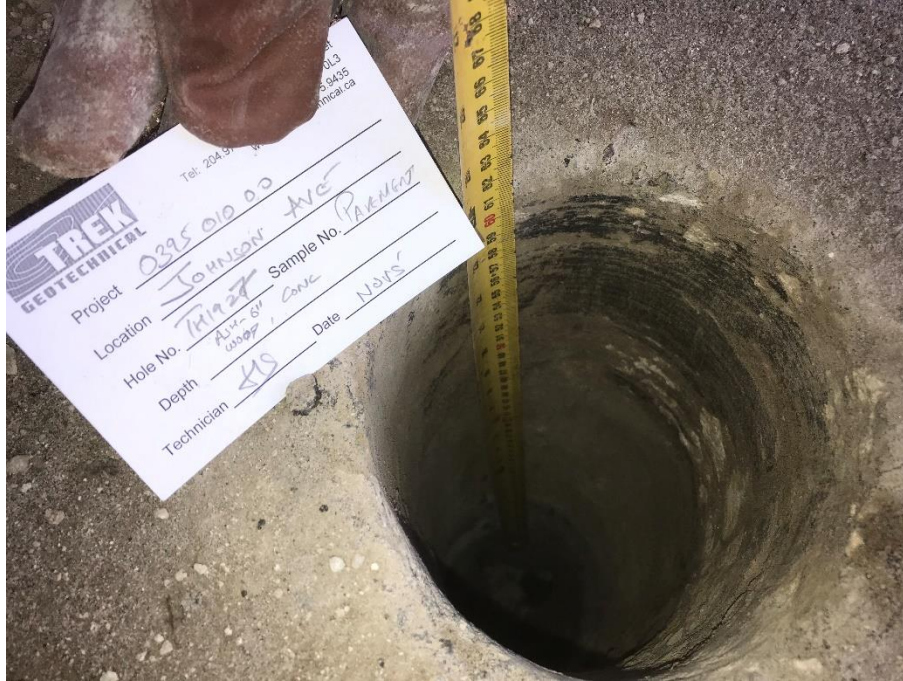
Pavement Core Measurement at Test Hole TH19-27
